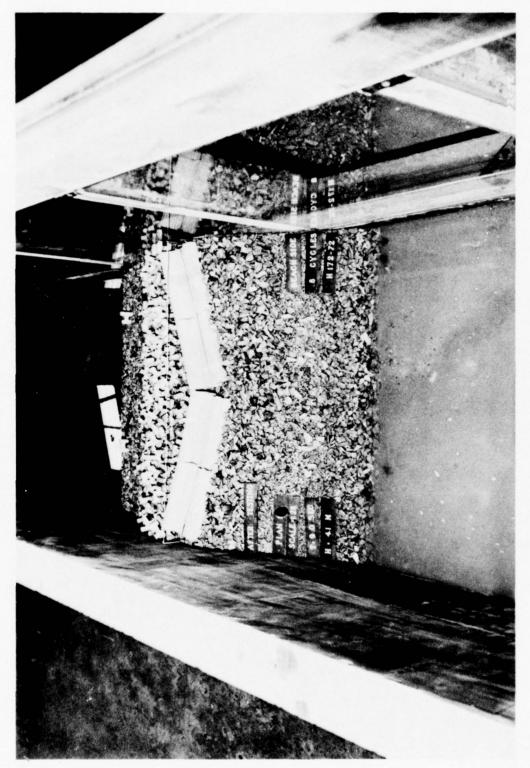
Beachside view of Plan 1 in the deeper water location after attack of 9-sec, 4.1-m waves at a swl of +2.35-m PBD
